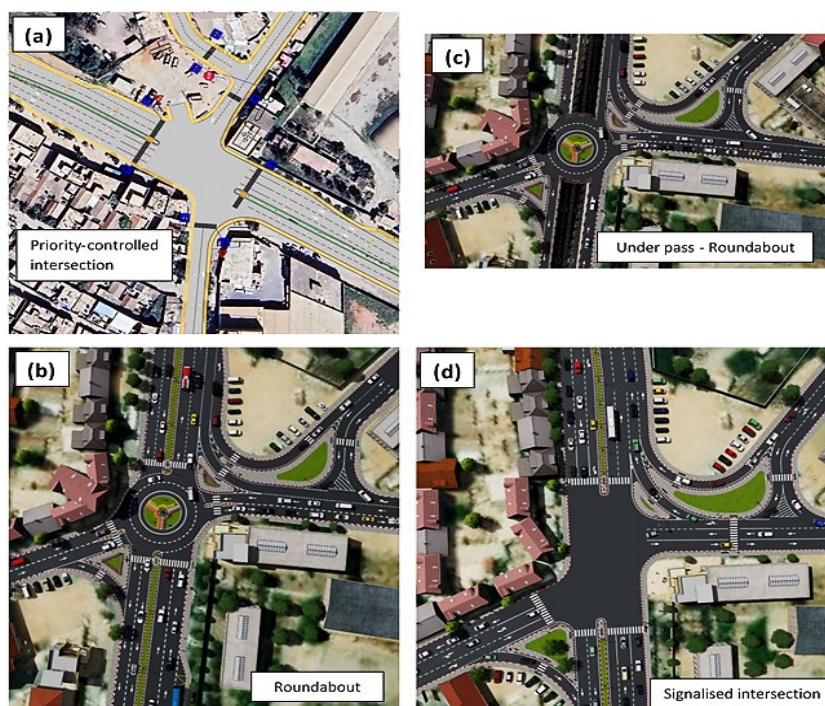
Suggested alternatives for the reconstruction of Chettia Crossroad: (a) alternative 1 (priority-controlled intersection), (b) alternative 2 (roundabout), (c) alternative 3 (under pass - roundabout), (d) alternative 4 (signalised intersection). Source: authors
